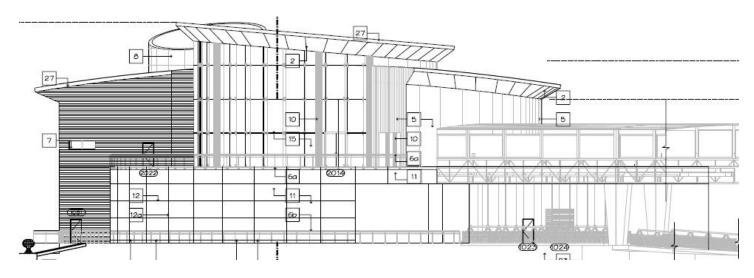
Exterior Elevation of Entry Pavilion and Bridges
